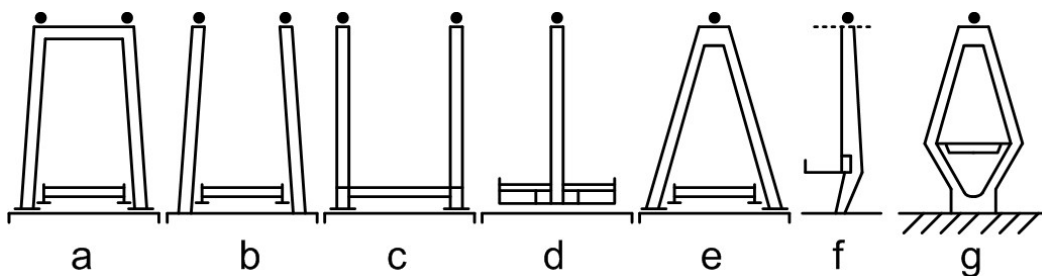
Shapes of Towers Used for Cable-Stayed Bridges
